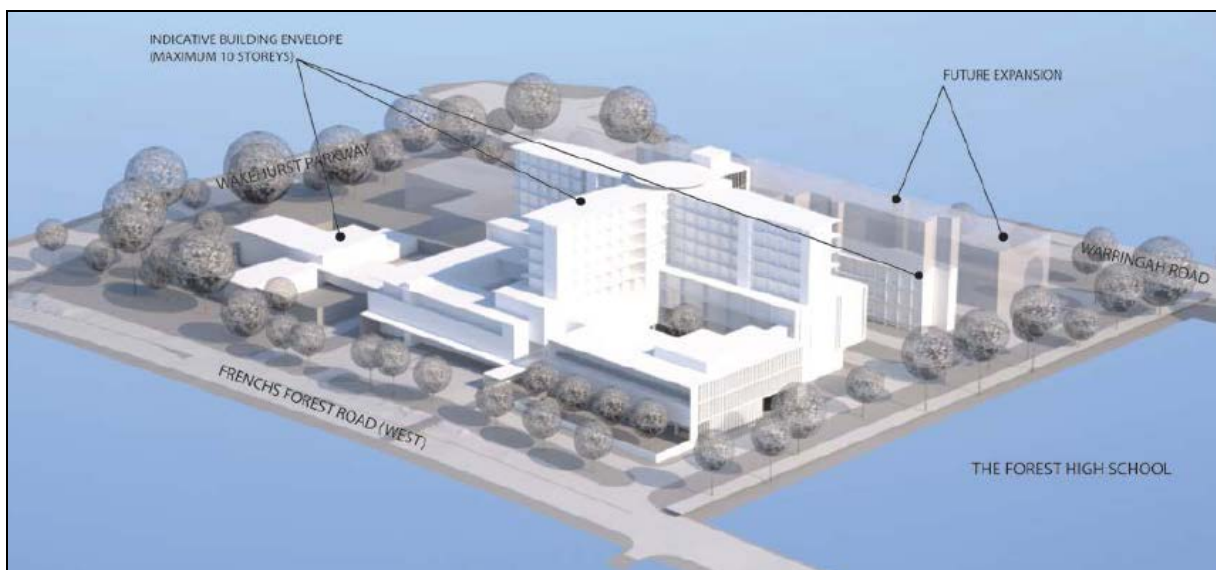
Indicative NBH Envelope and Site Layout Reference Design – north western view
